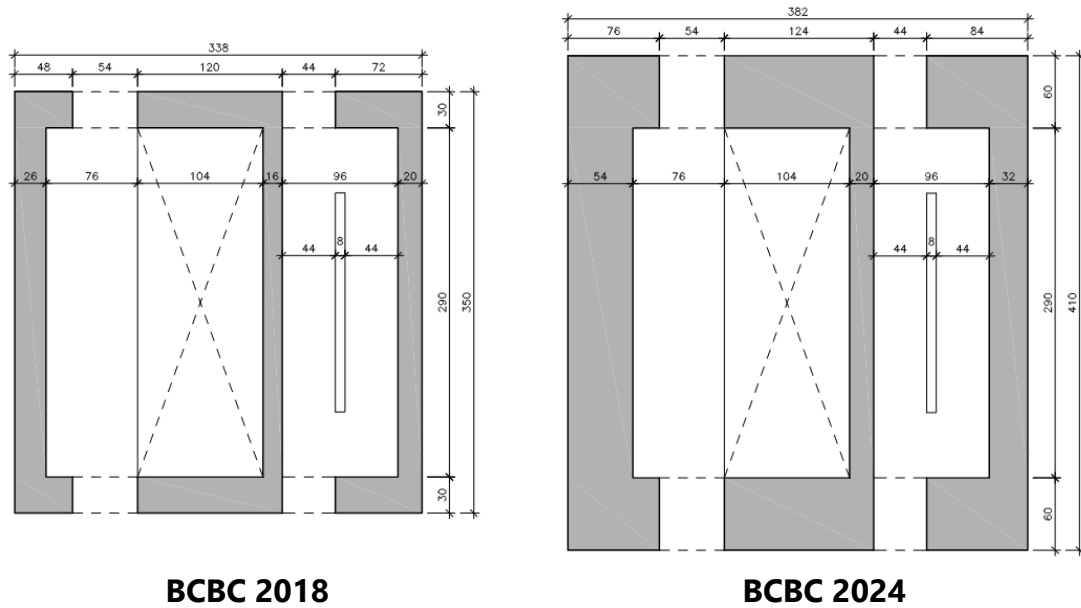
C – Concrete Tower Design Group 3 Comparison Plan
